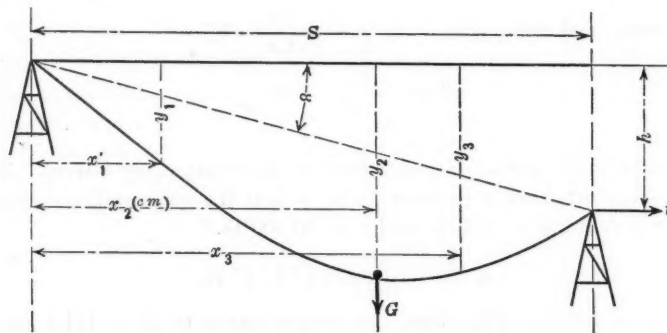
SPAN CARRYING A SINGLE LOAD.
